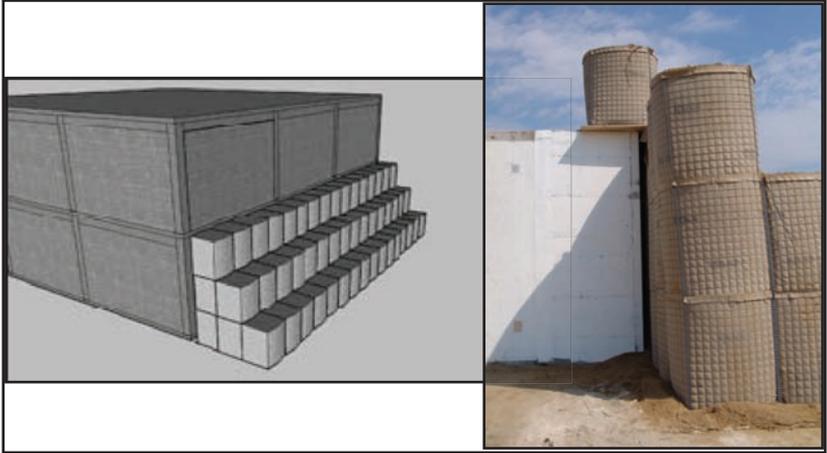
Soil-filled container exterior wall retrofit concept and test wall with gap.
